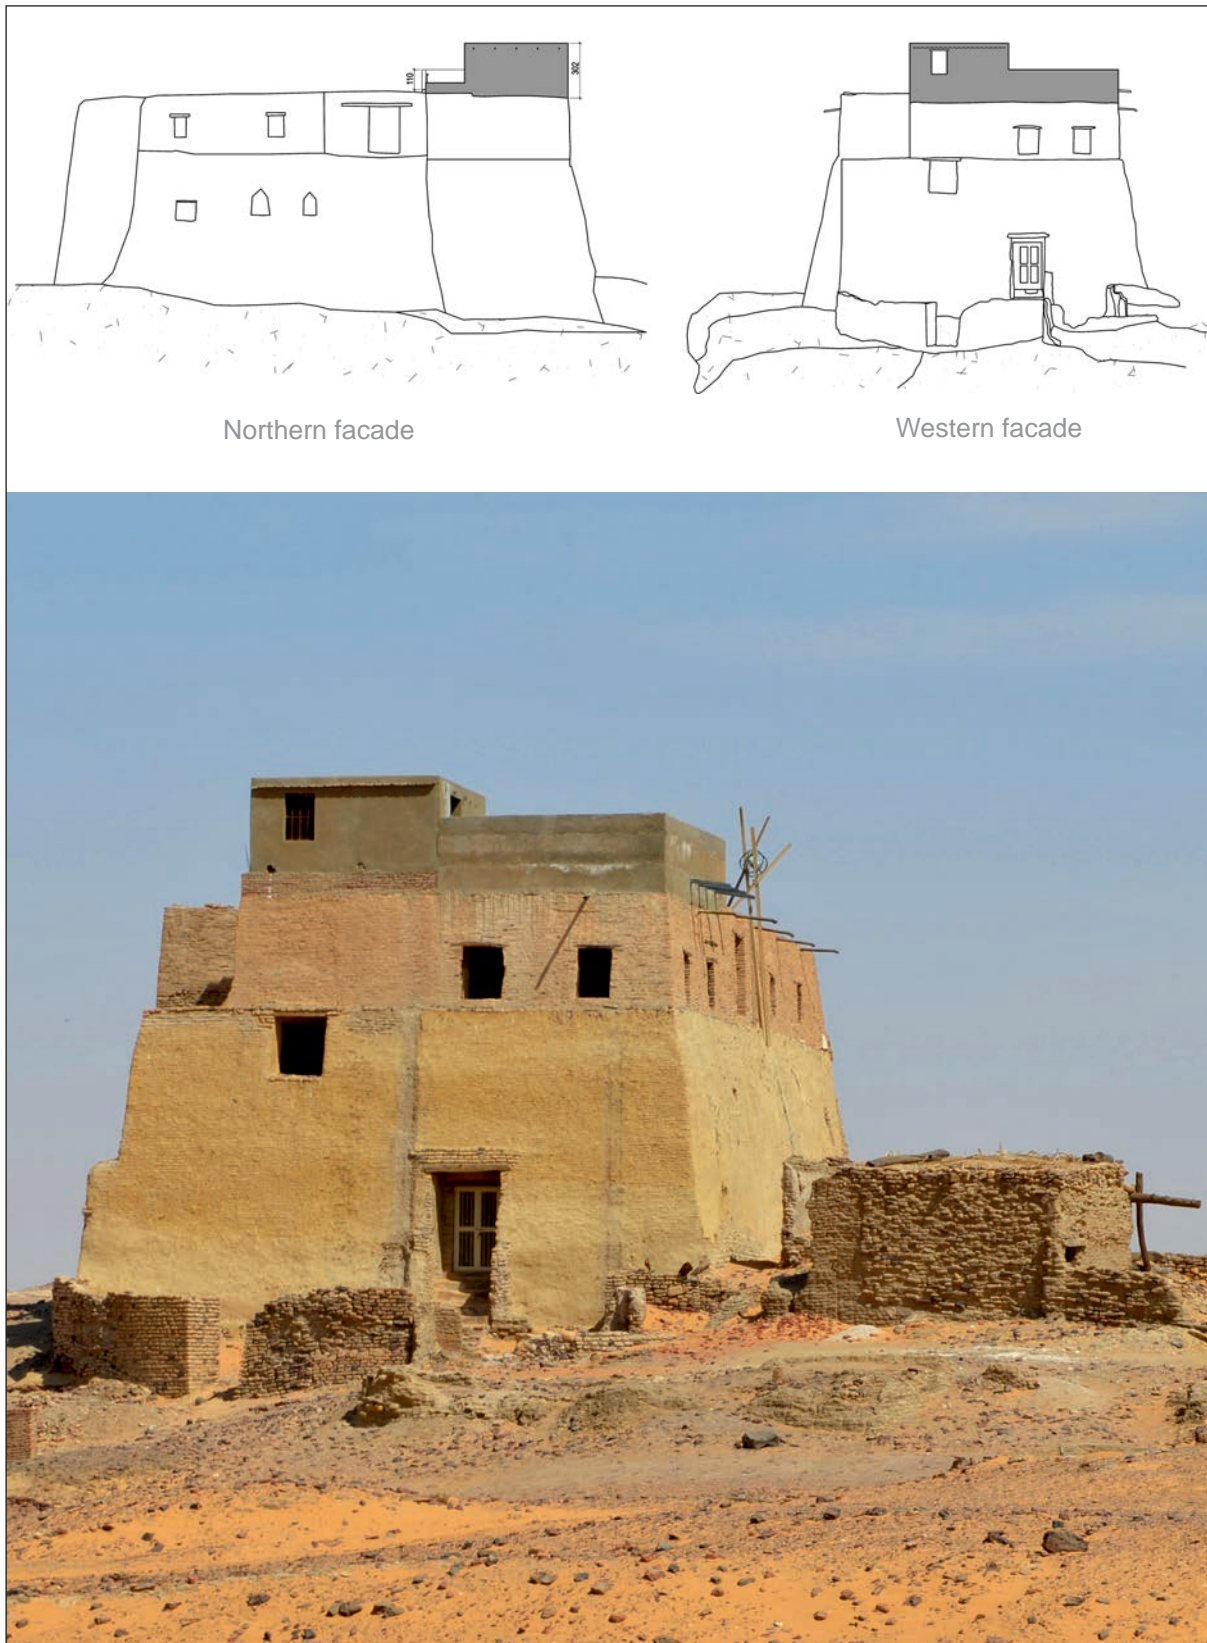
The Mosque Building from the southwest after completion of the work; top, the northern and western building façades
